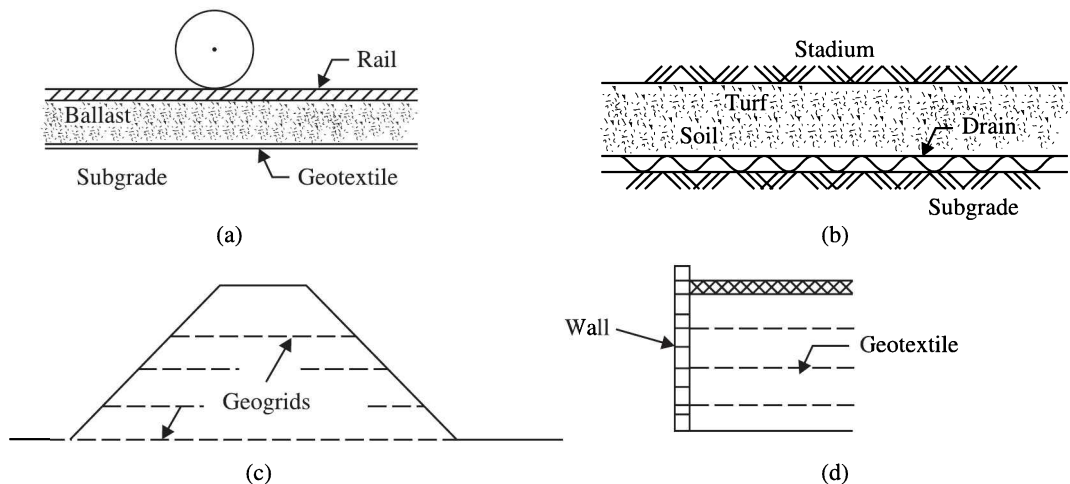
Use of Geotextiles (a) For separation (b) For separation and drainage (c) As reinforcement for bridge embankments (d) As reinforcement for retaining walls.
